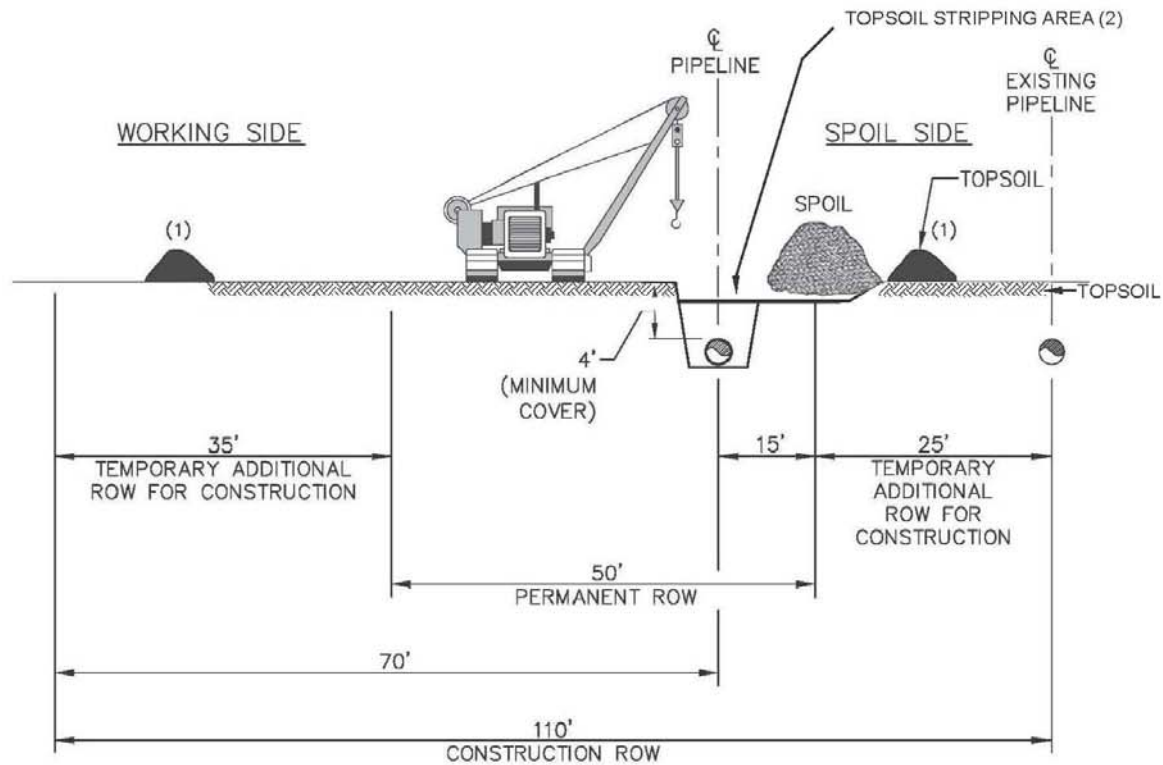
is a typical construction ROW with the 25-foot minimum offset needed during construction on a shared ROW.
